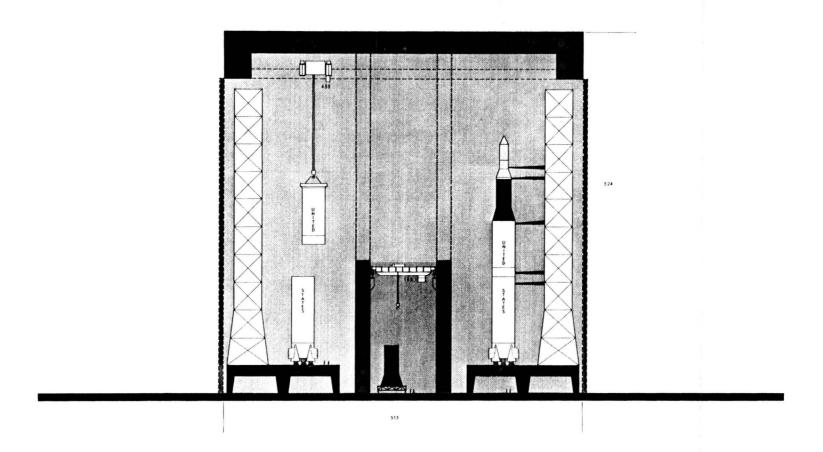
CROSS SECTION HIGH BAY AREA OF VAB
